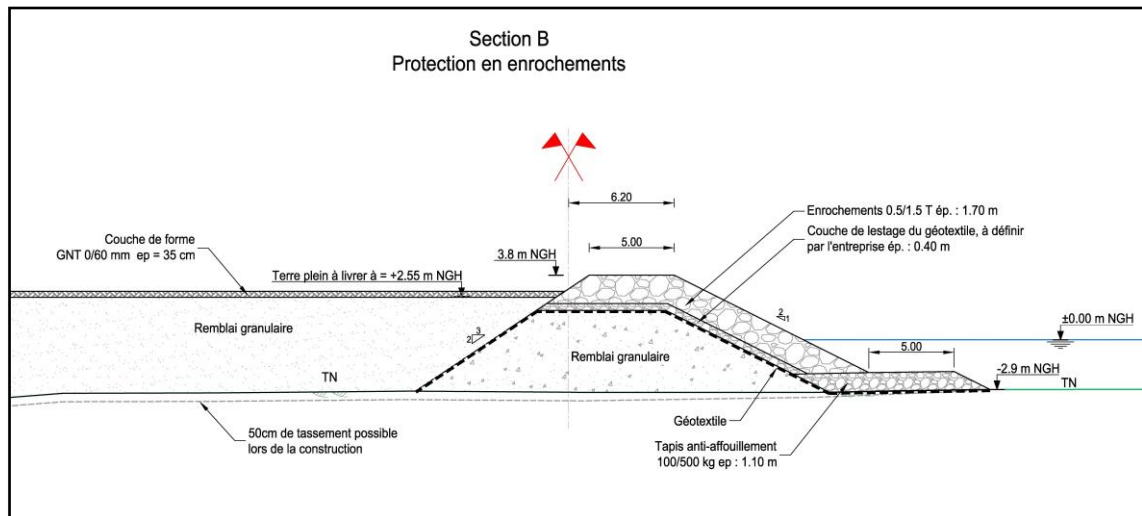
Eastern protective berm – cross section B (Artelia drawing (2015))
